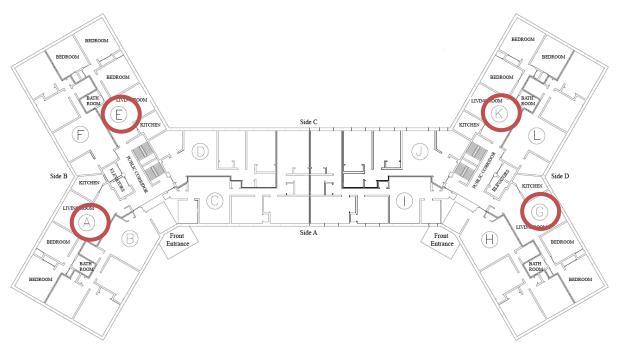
Floor Plan for Floors 2-7 (Fire Apartments Circled)
